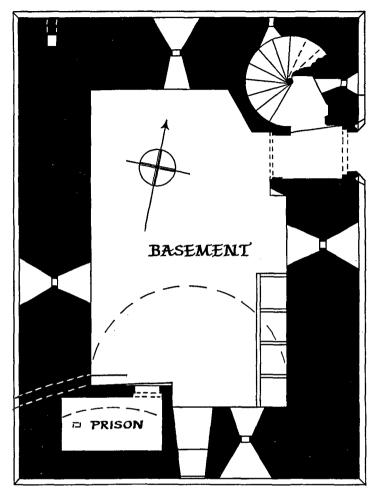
Bonshaw Tower, ground-floor plan (scale 1:96)
